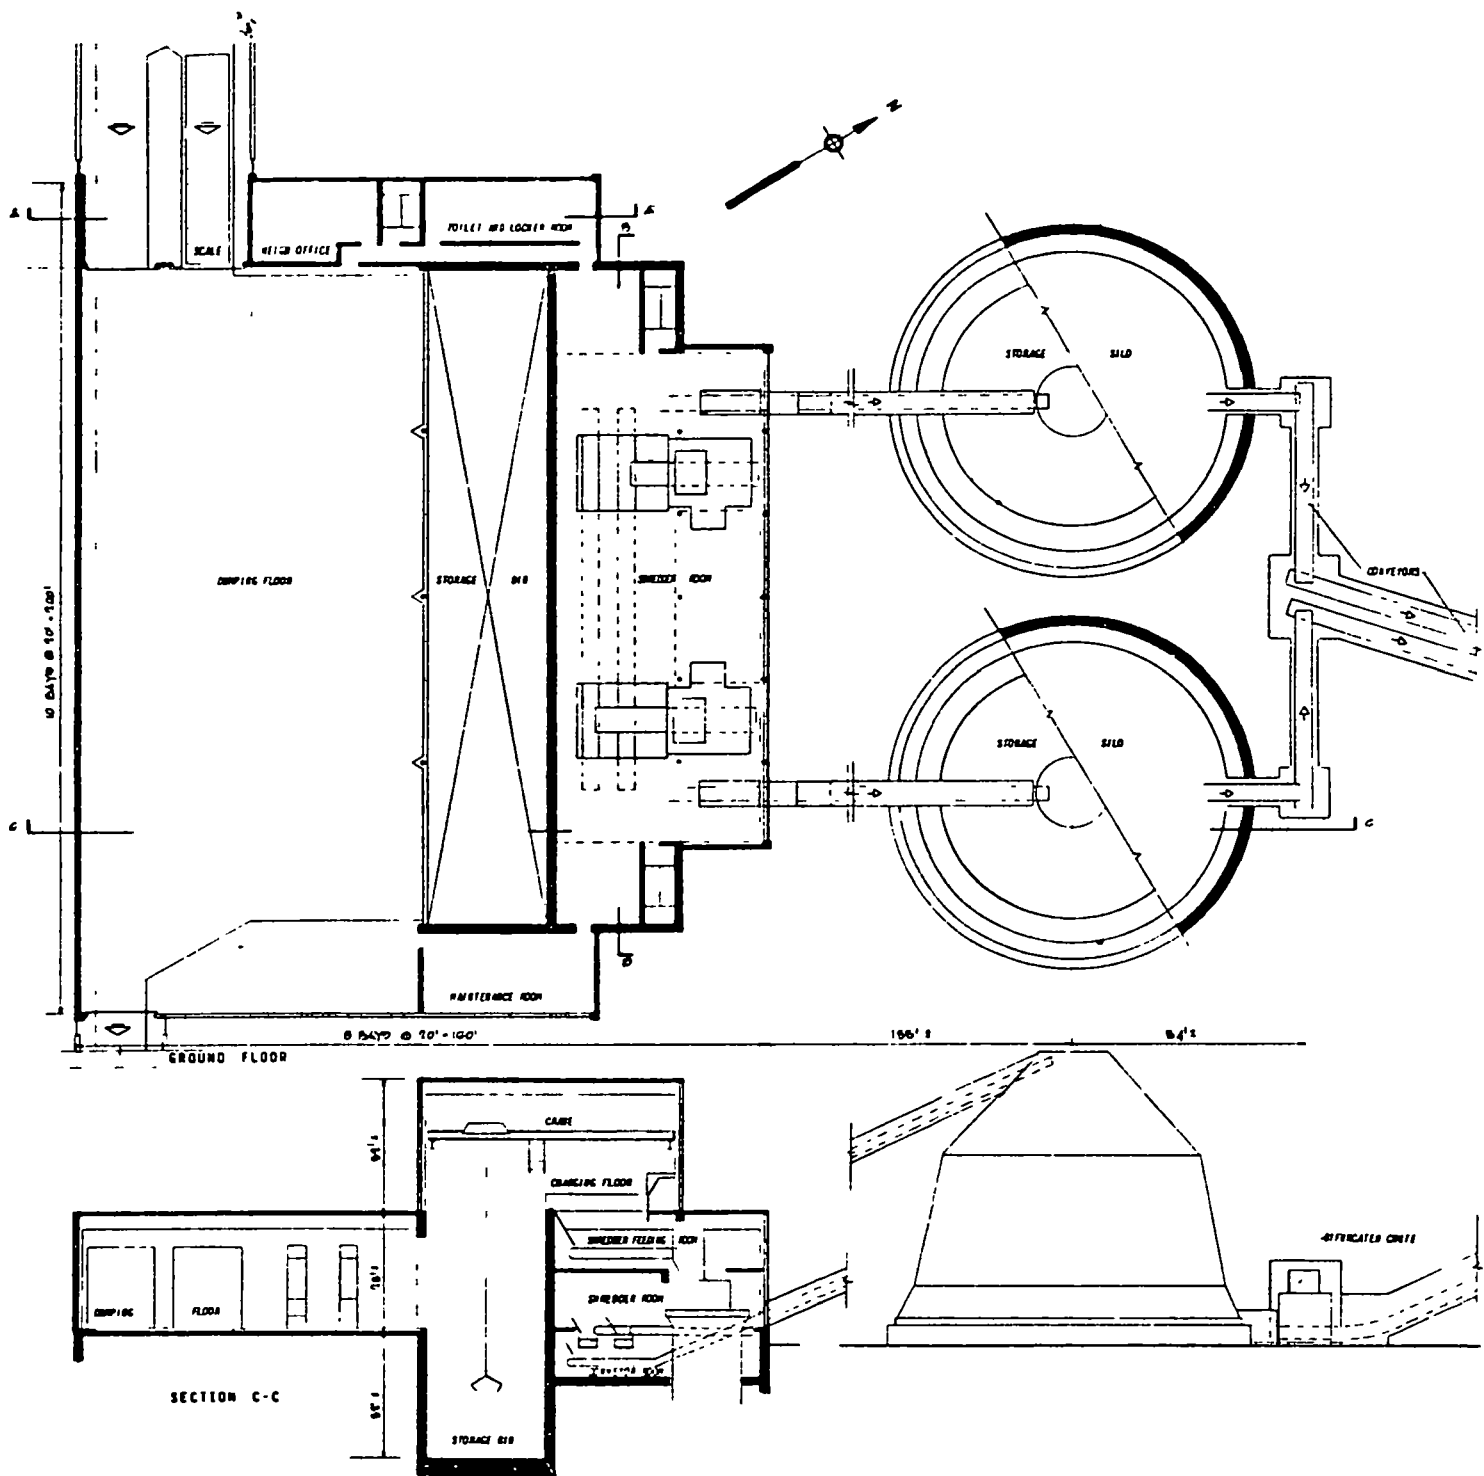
ALTERNATIVE A-II - SITE PLAN,
